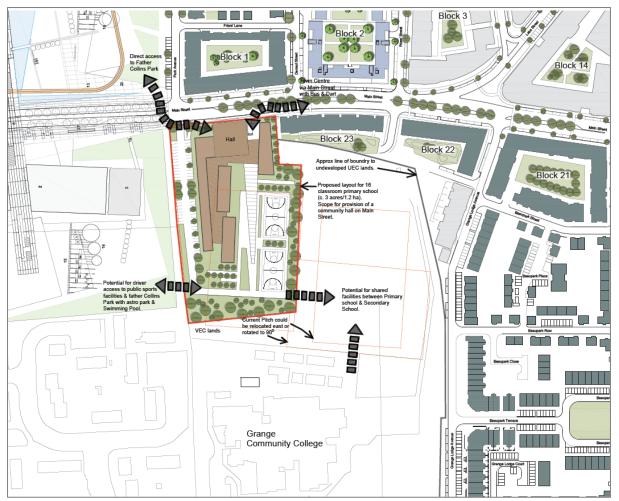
CCK Architects' Indicative Sketch Proposal for City Development Plan School Designation Site
